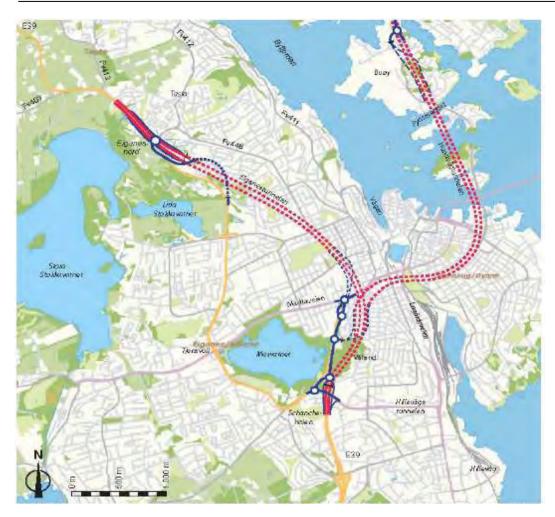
Above map shows Eiganes North, the Eiganes Tunnel and the connection to Rv 13 Ryfast through The Hundvåg Tunnel
